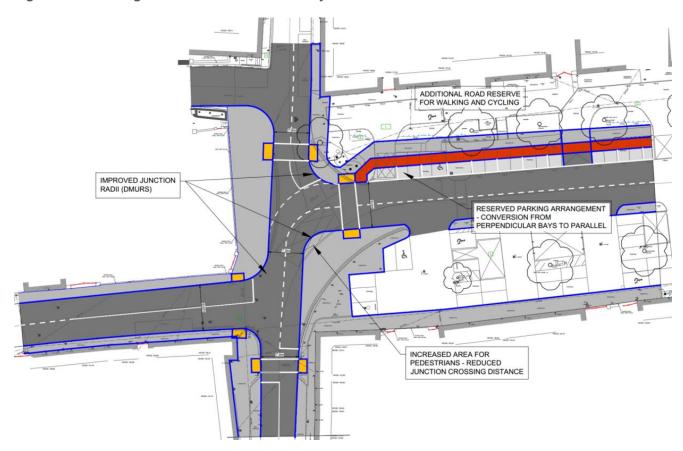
Potential Junction Layout (Option 1) - J1
